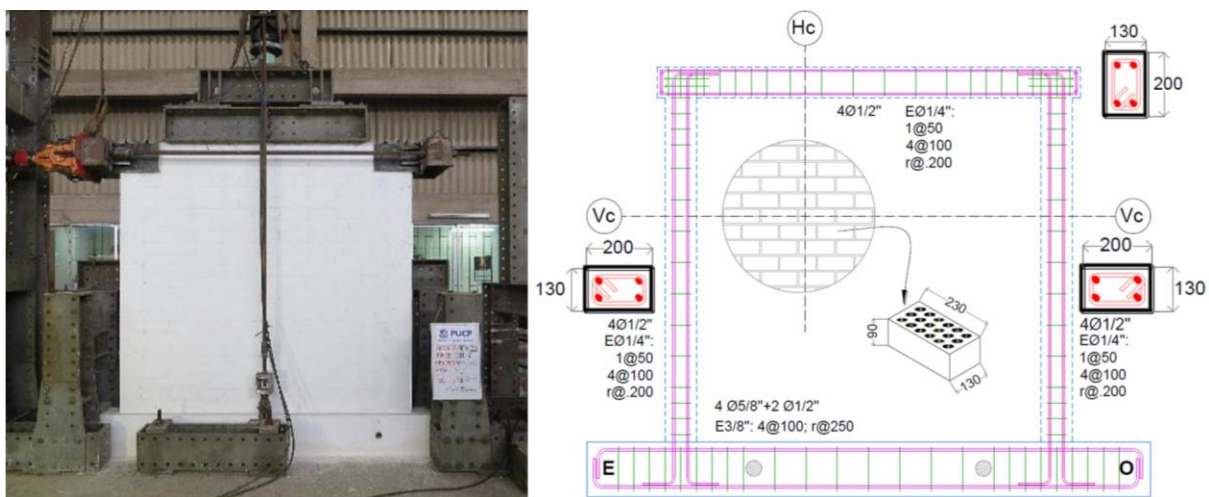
CM wall previous to the cyclic test (left). Construction details of CM walls (right).
